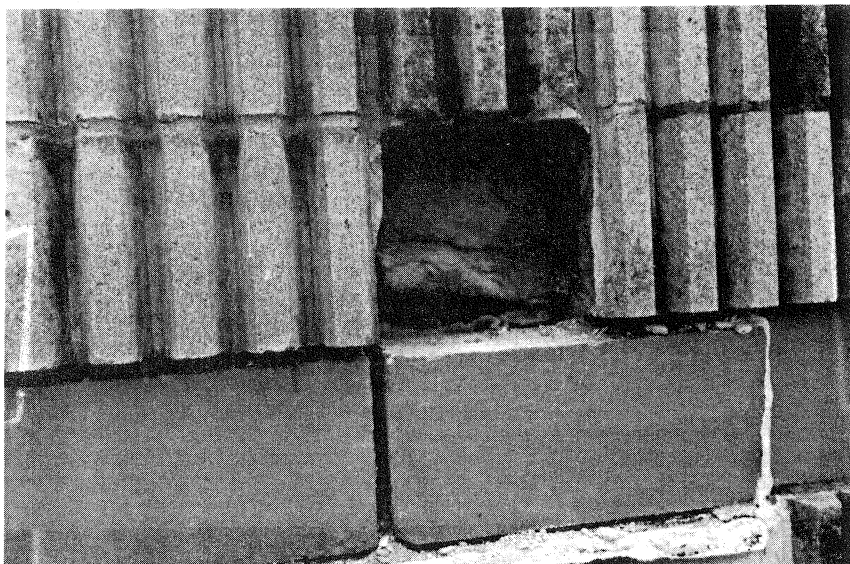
Mortar Missing, Concrete Block Displaced near Parapet
